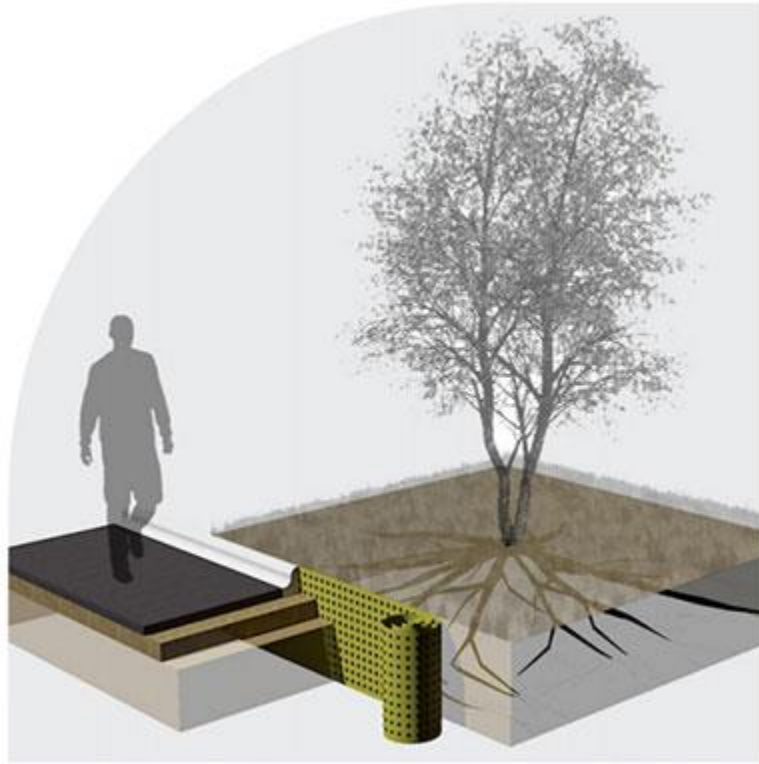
Example of root barrier, called BioBarrier, used to prevent damage to paved trails (TYPAR, 2012).
